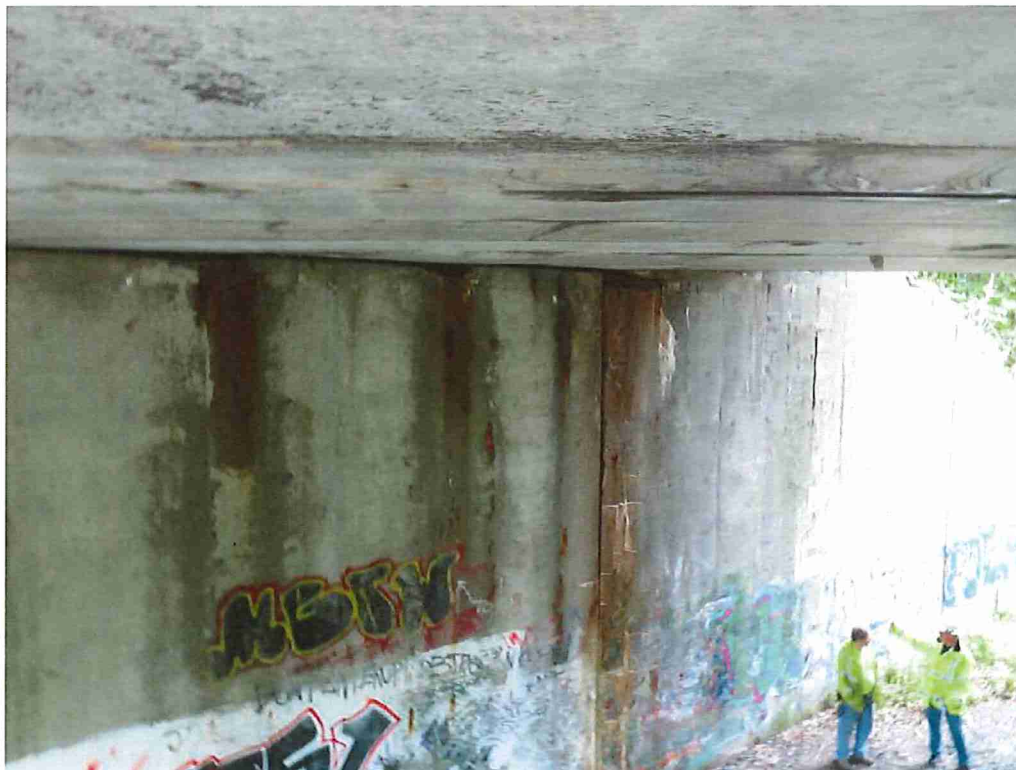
Rust staining and minor spalls in the east breastwall.
